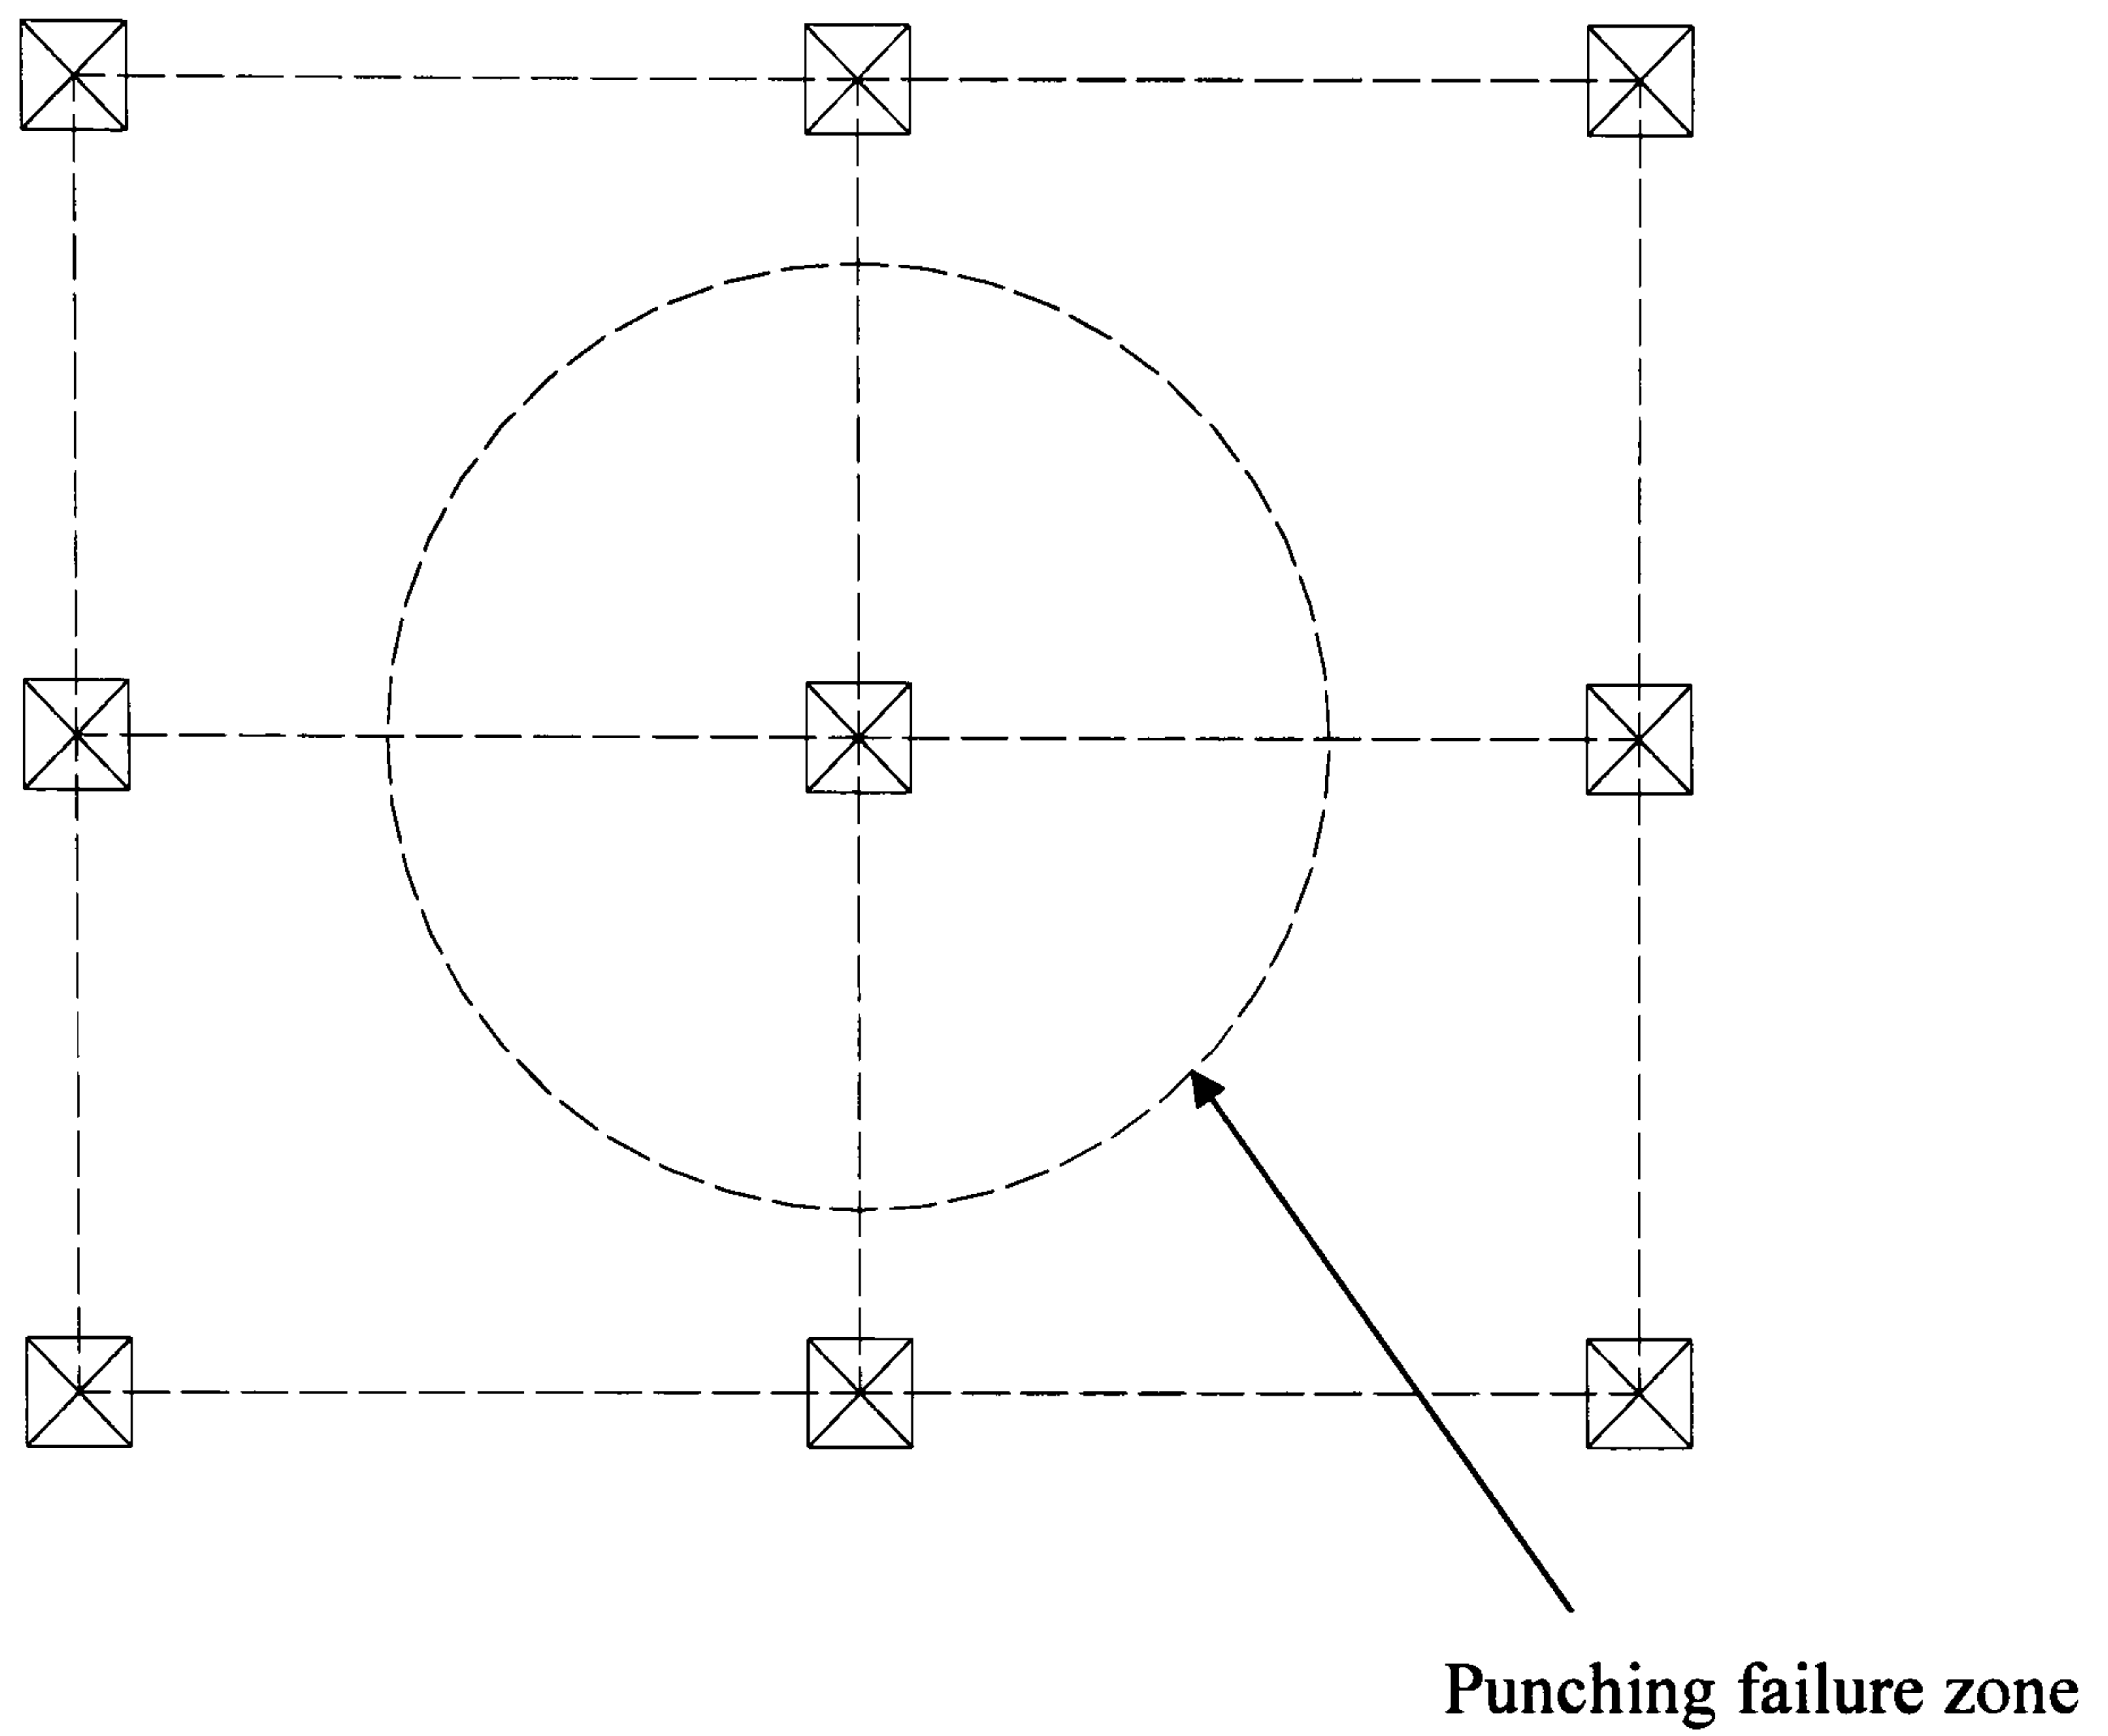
(a) Plan layout of a flat slab monolithic with supporting columns
